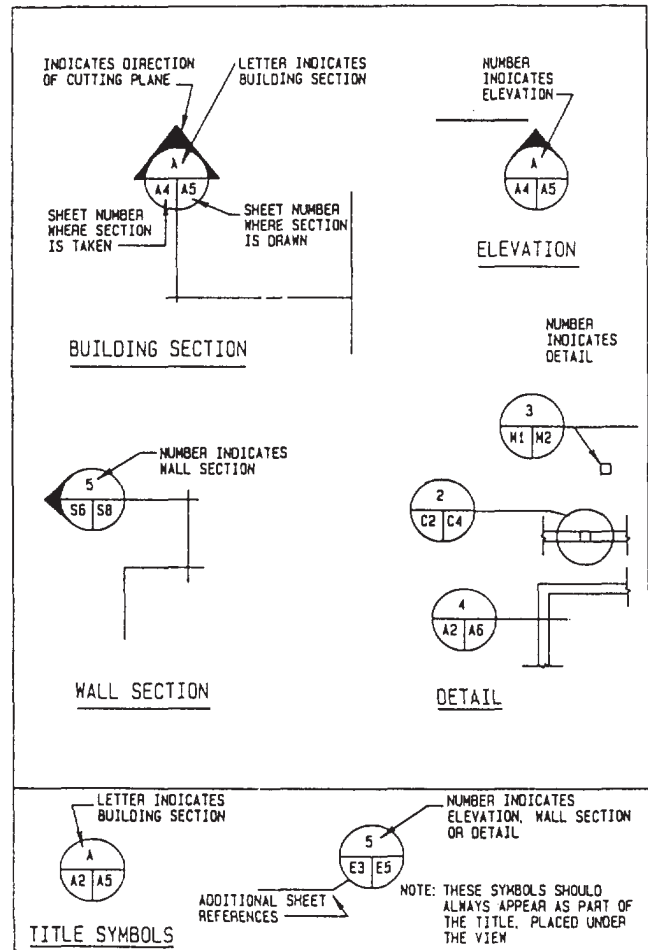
Symbols used to identify sections, elevations, and details.
